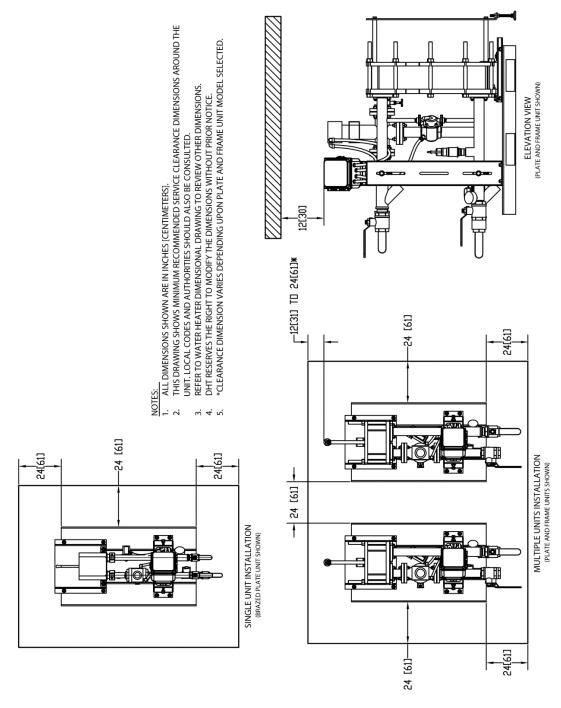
SuperPlate Installation Clearance Drawing
